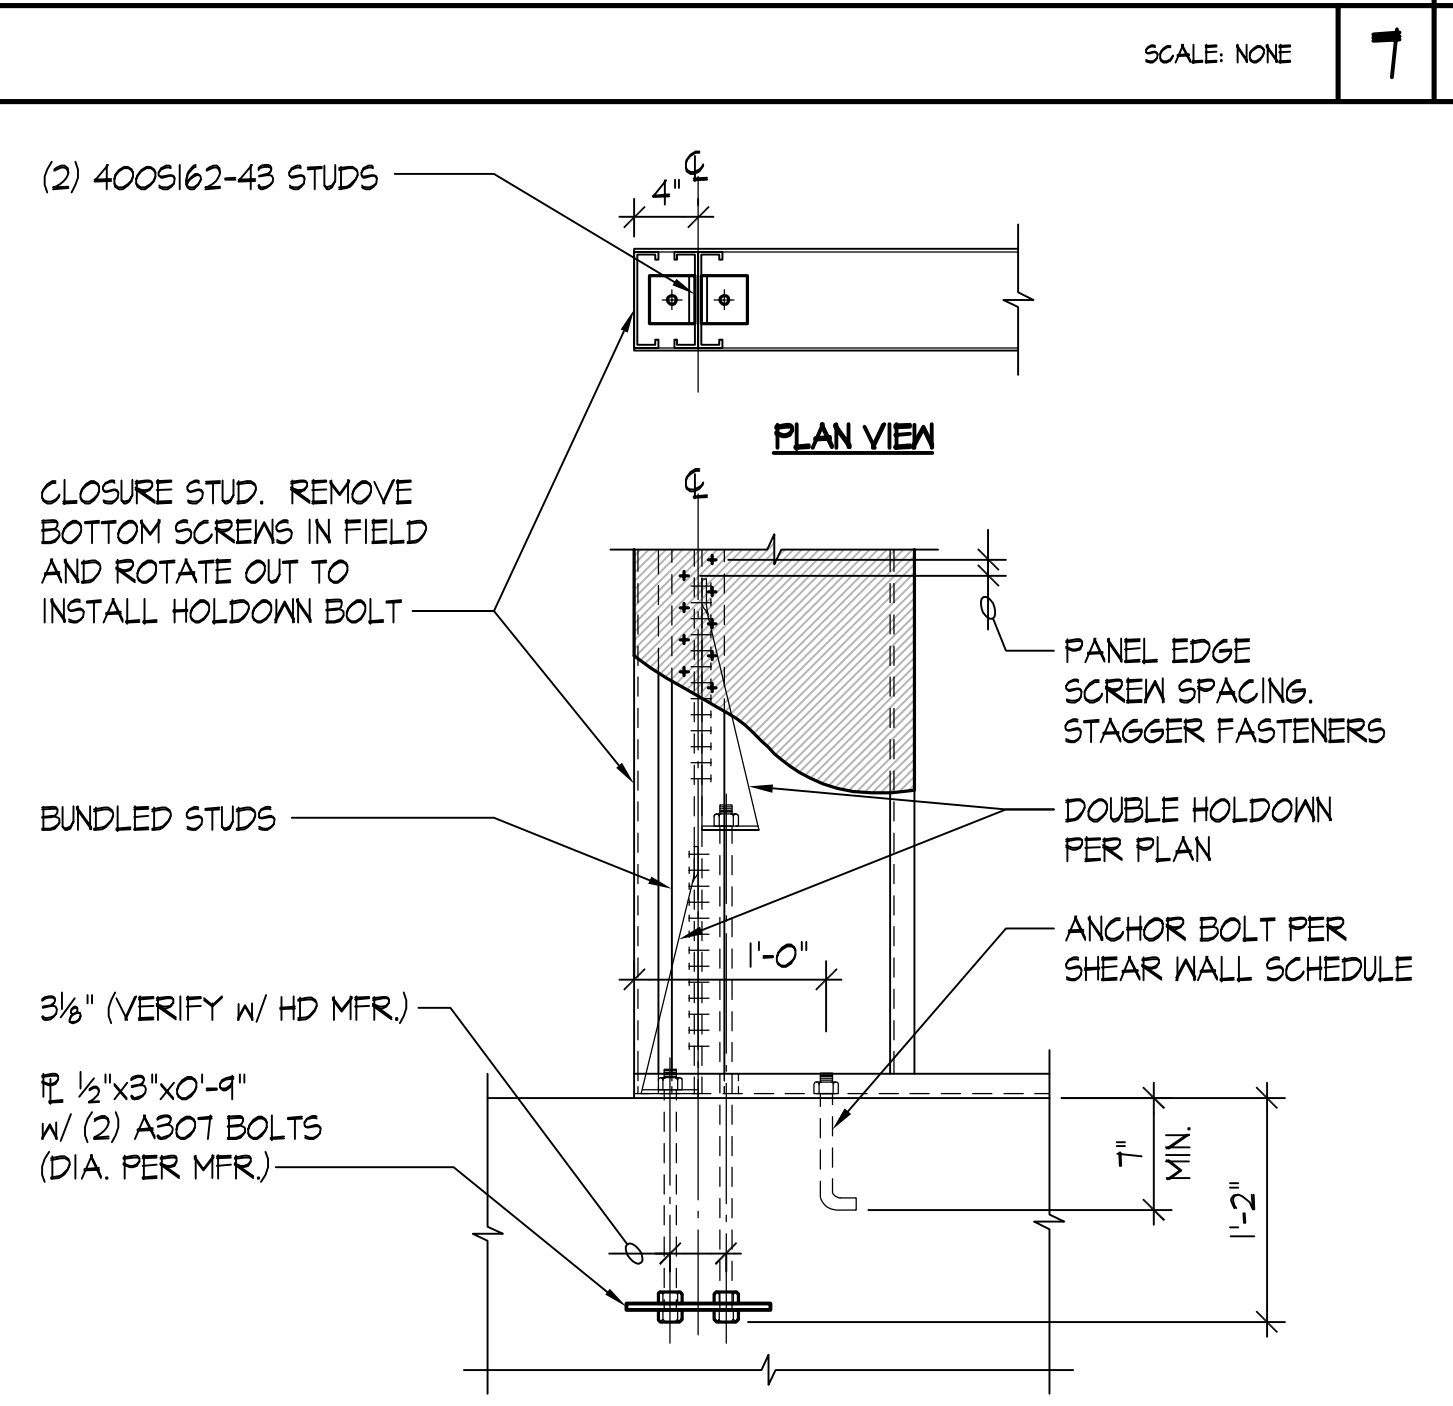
DETAIL SCALE: NONE | 4 TYPICAL BOLTED HOLDOWN AT CONCRETE SCALE: NONE
